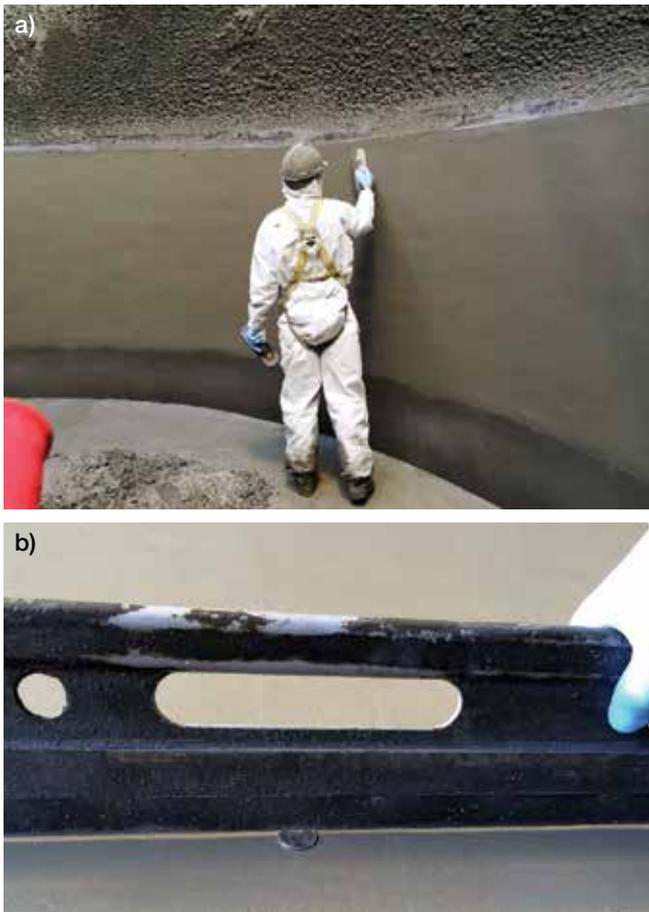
(a) Steel trowel finishing; and (b) checked finish tolerance with a Canadian quarter, which is less than 2 mm thick
